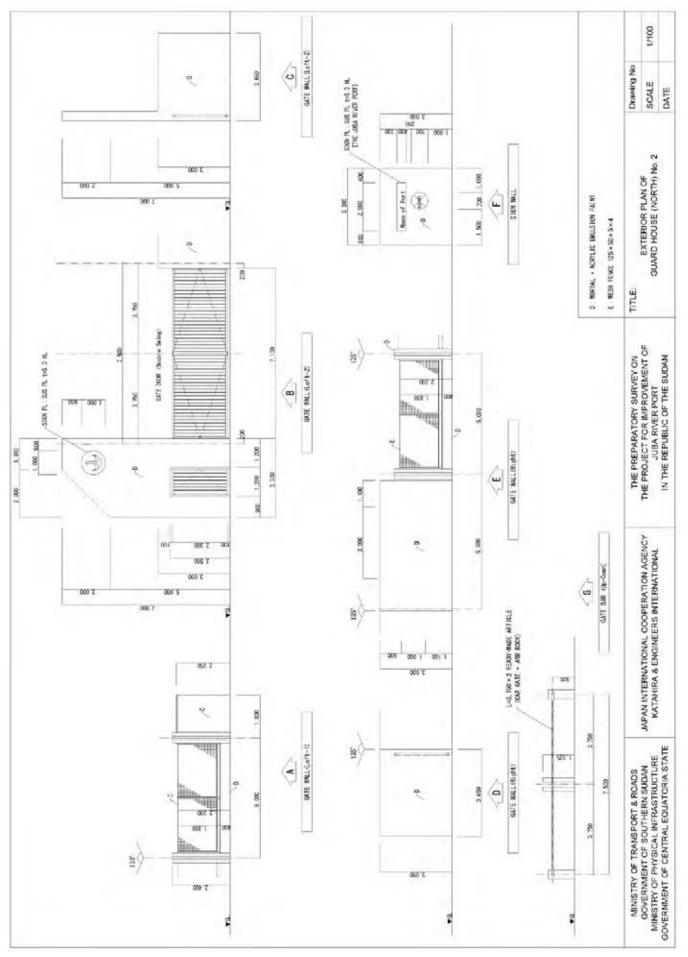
Exterior Plan of Guard House (North) No.2
